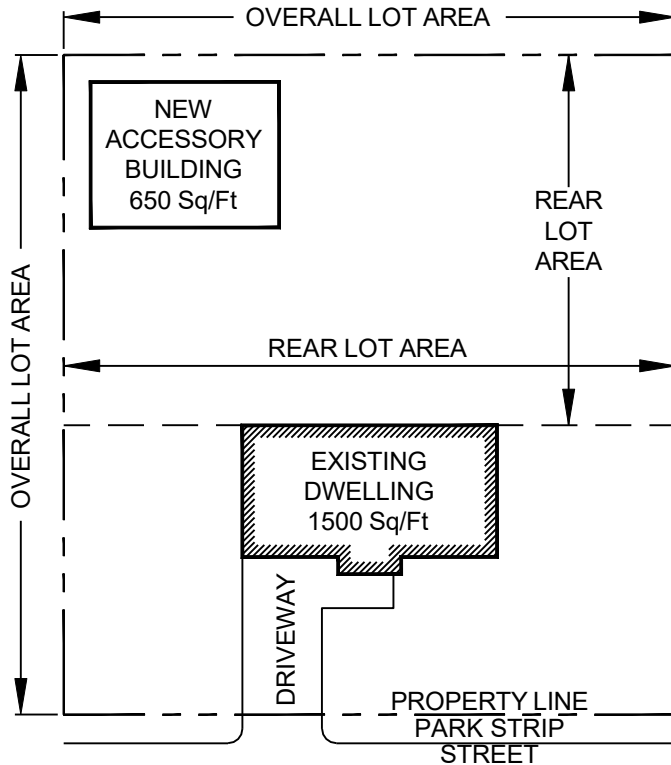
EXHIBIT ABOVE IS SHOWN AS AN ILLUSTRATIVE EXAMPLE ONLY. APPLICANT SHALL VERIFY PUBLIC UTILITY EASEMENT REQUIREMENTS PRIOR TO PLACEMENT OF ACCESSORY BUILDINGS
